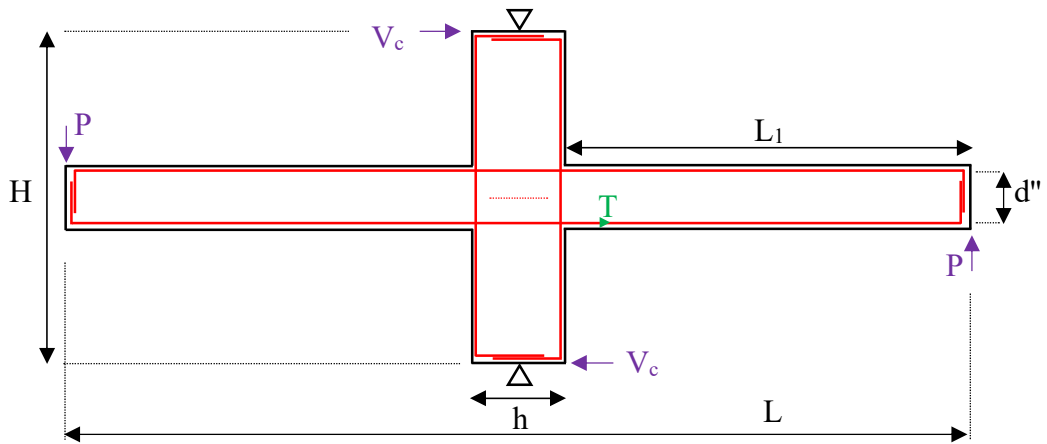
Interior beam-to-column connection loaded at beam ends.
